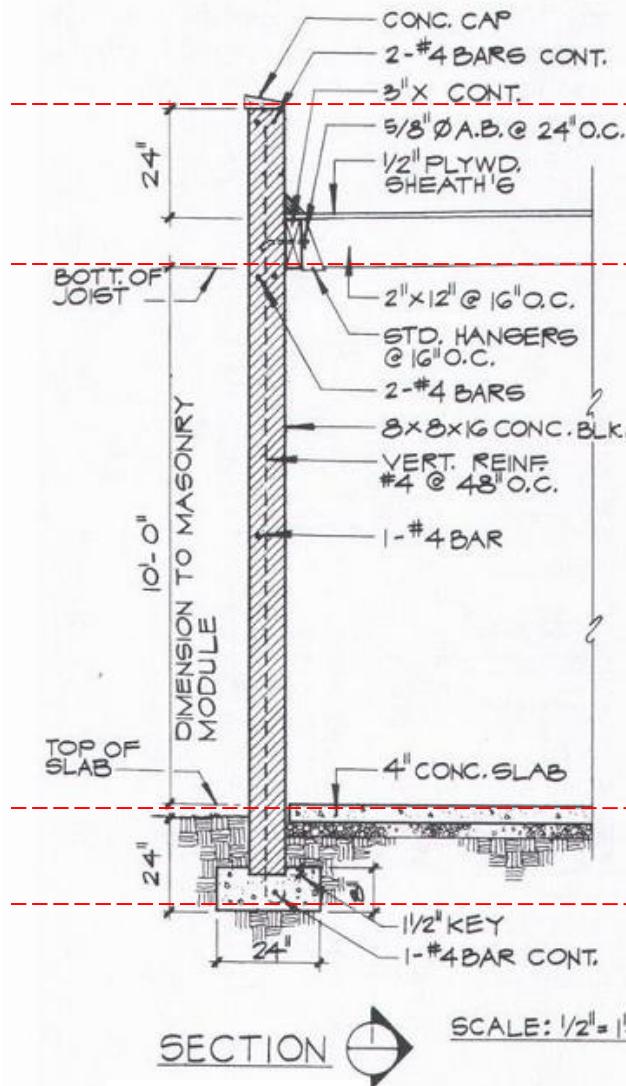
Exterior wall section. Figure 10.10 Interior wall section. Figure 10.11 Exterior wall section.
